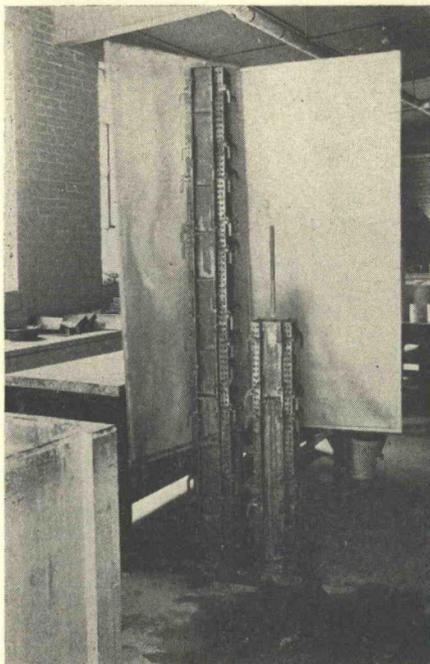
One Full-Length Beam and a Half-Length Beam-Type Specimen in Steel Forms.
